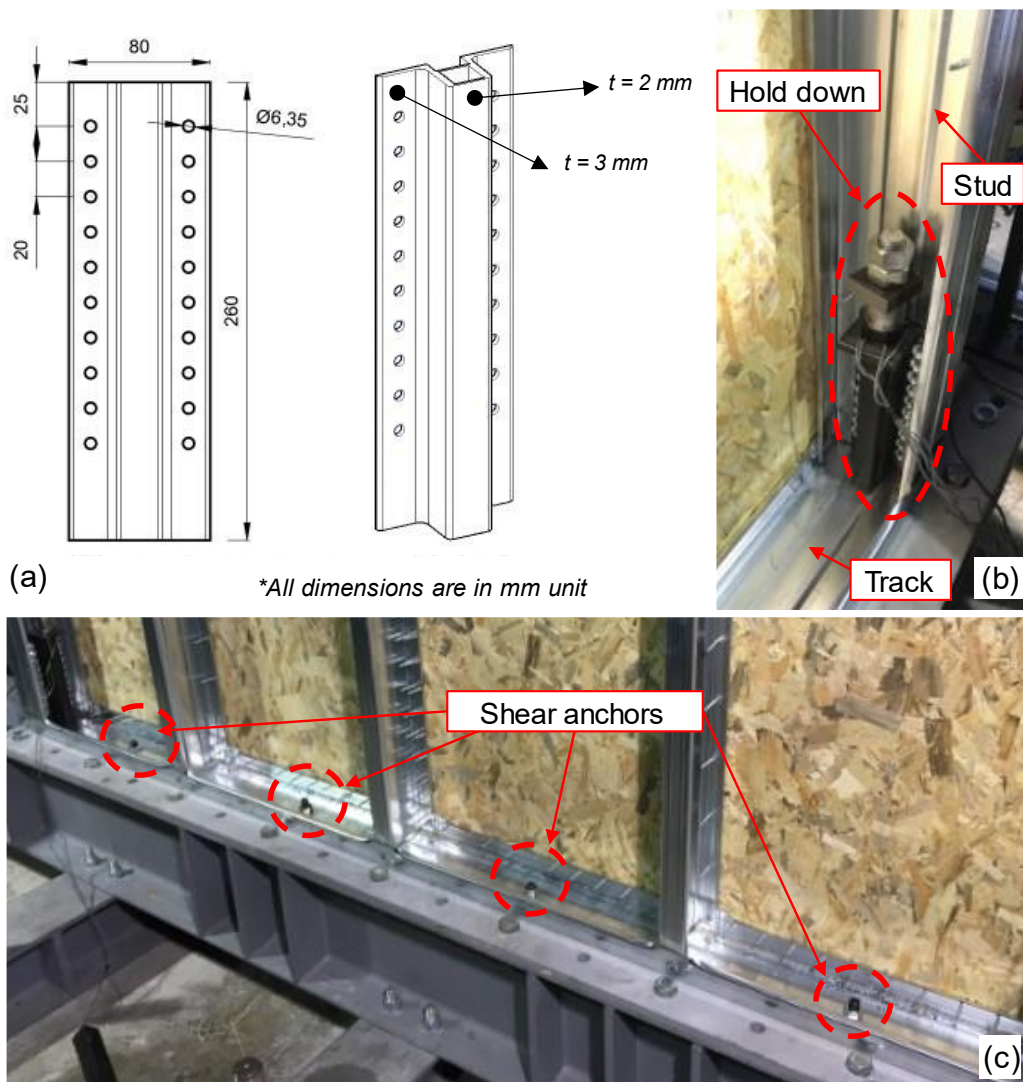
Connection of wall panels to the foundation: (a) details of hold down device; (b) hold down attached to an end stud; (c) shear anchors
